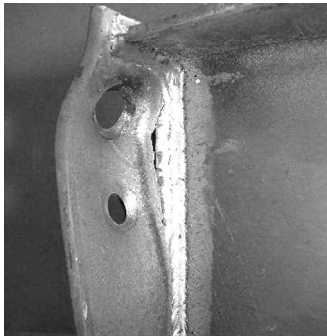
Fracture of endplate in test specimen after test at 20°C
